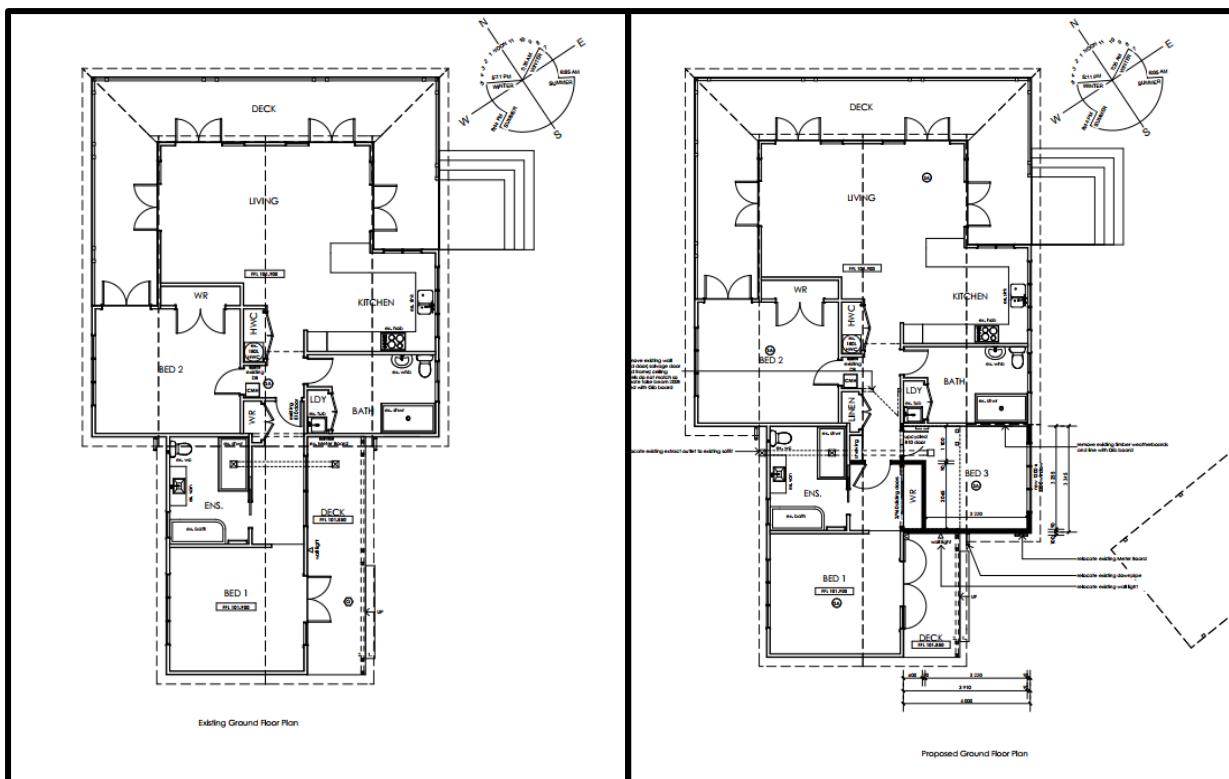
Existing floor plan (left) and proposed floor plan (right).
